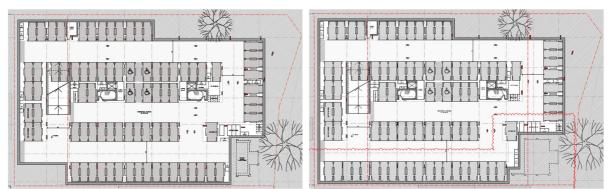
Basement 2 Plan Comparison (amended on the right) (Source: plus architecture)
